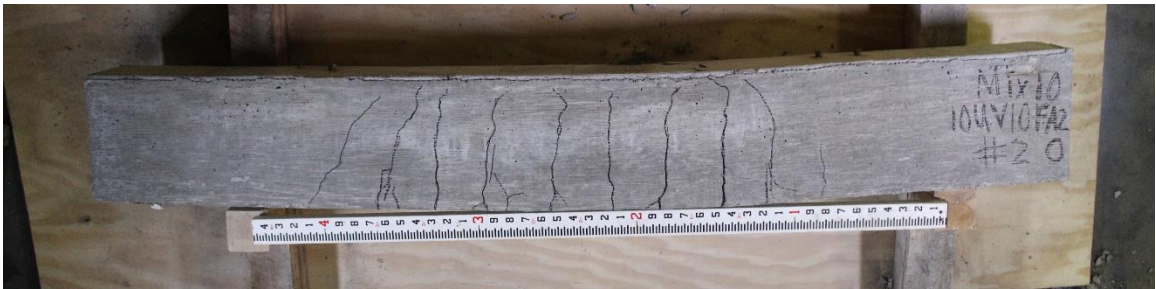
Mixture 10 (10UV10FA2) beam #20: concrete beam side view.
